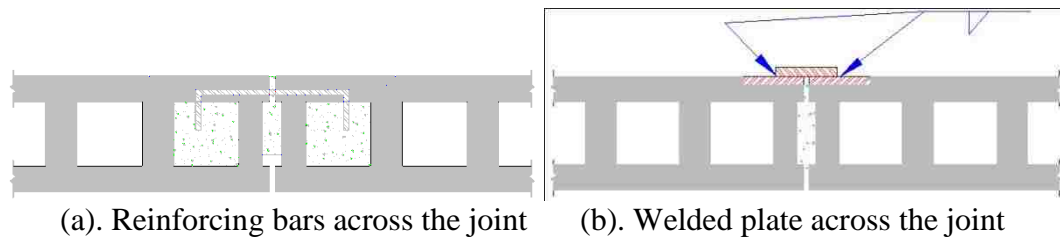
Embedded reinforcing bars across the joint (Cao 2006)
